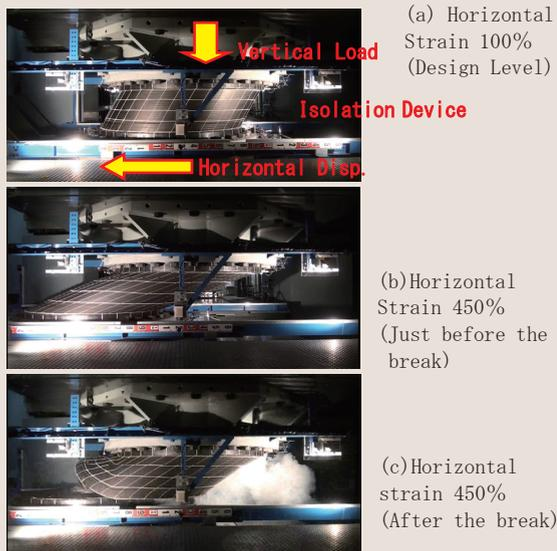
Typical deformation of a full-scale seismic isolator under horizontal loading
